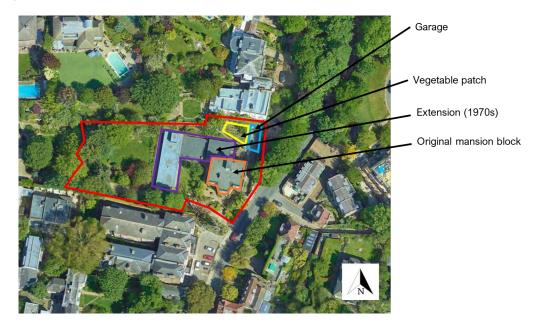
Exisiting site layout (red line indicative of site boundary)
